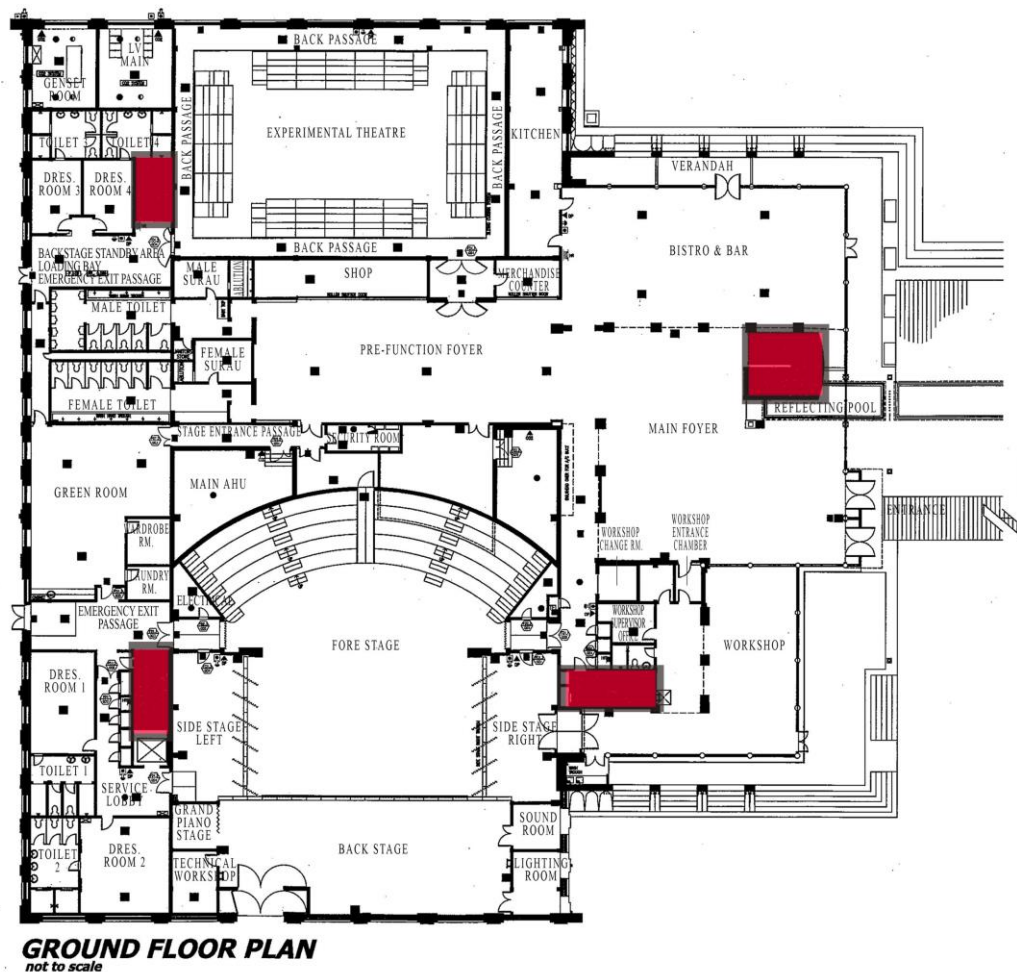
Diagram showing locations of all the fire emergency staircases at the ground floor.
